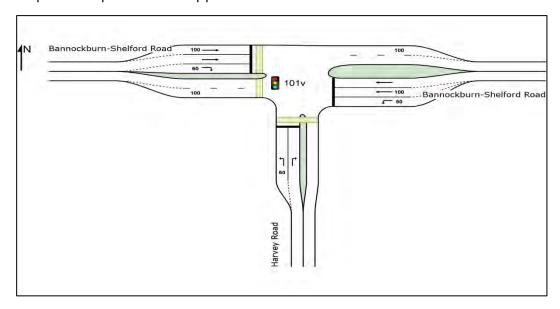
Harvey Road / Bannockburn-Shelford Road SIDRA intersection layout
